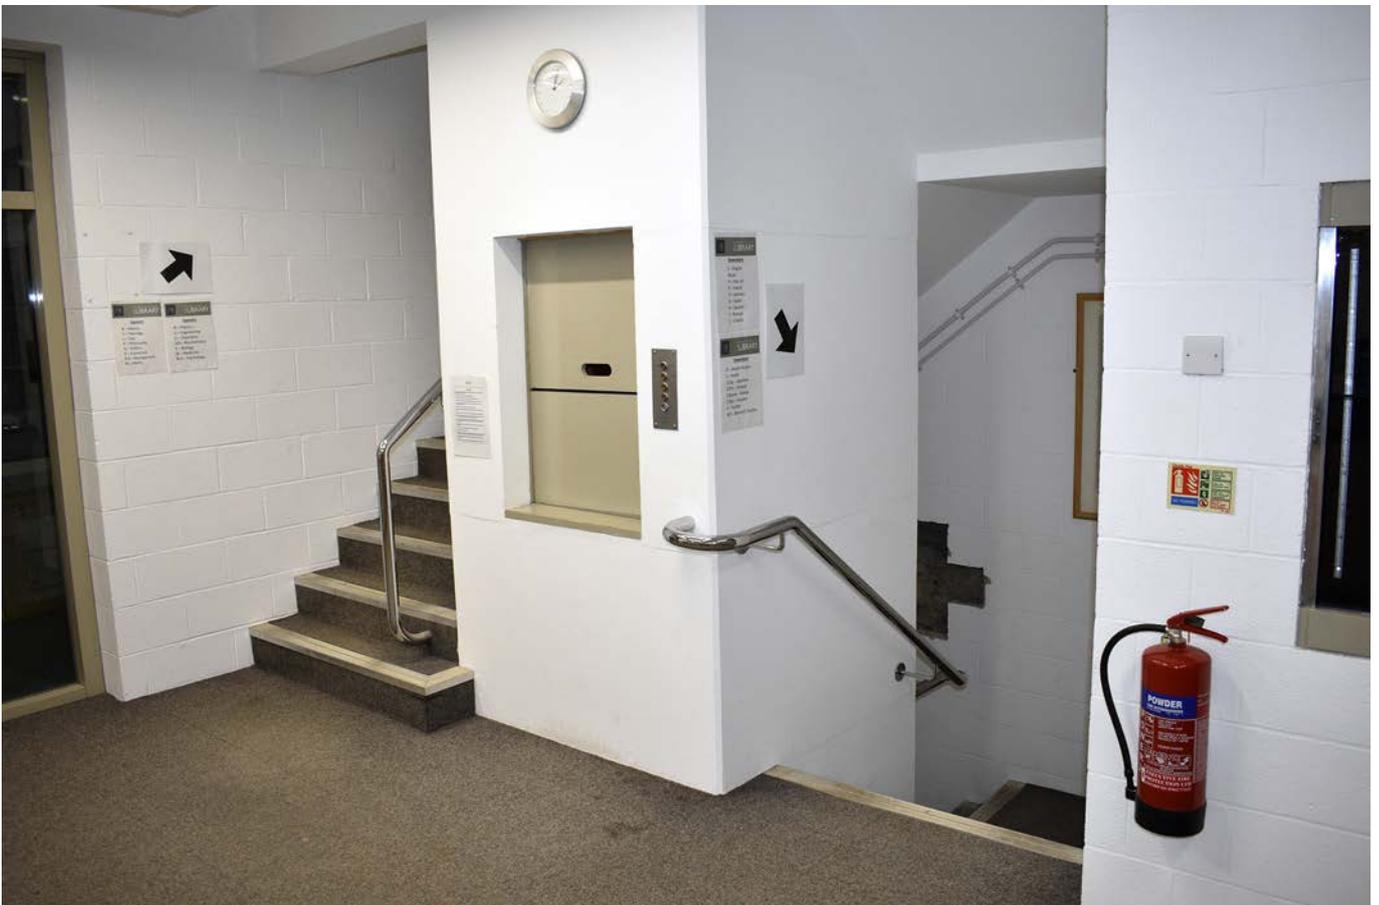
Stairs in library at Ground Floor, lower hole [A] in wall visible to lower landing
